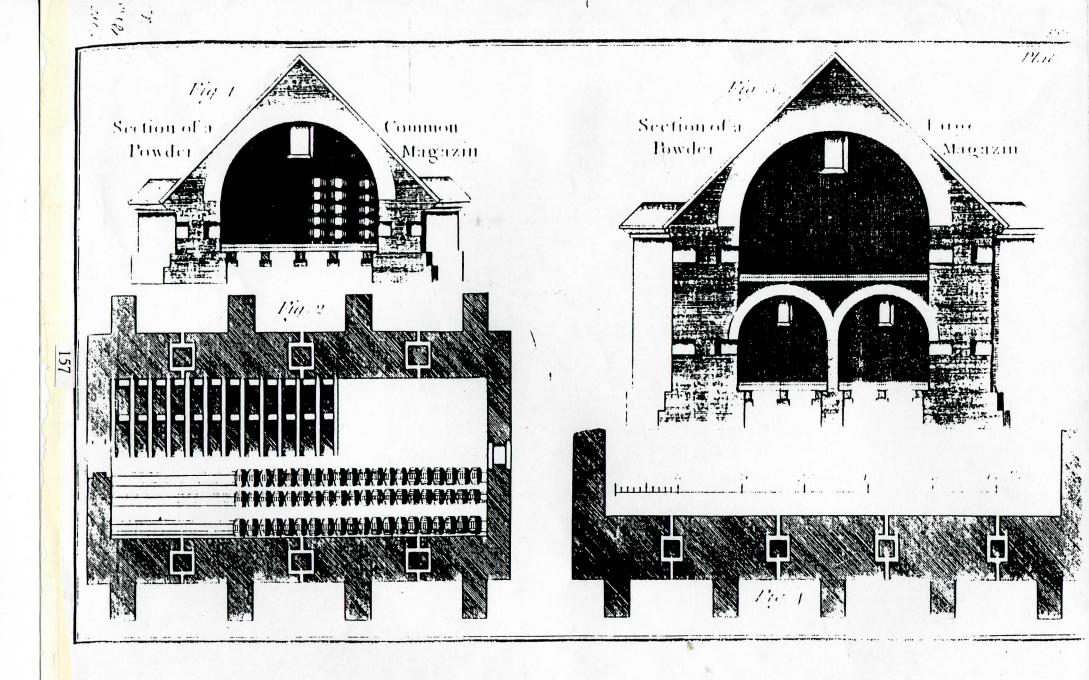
plan of barrel-shaped magazine at Tilbury Fort
